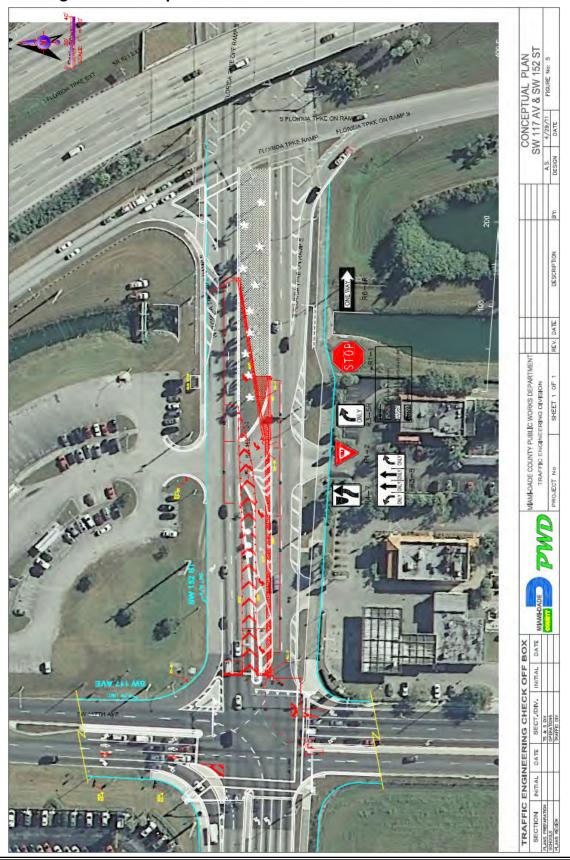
Conceptual Plan – SW 117 Avenue and SW 152 Street
